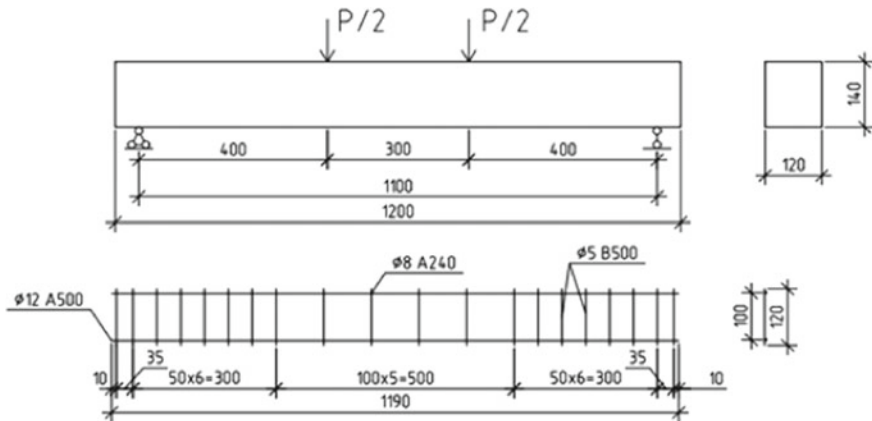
Scheme of reinforcement and loading of a reinforced concrete beam
